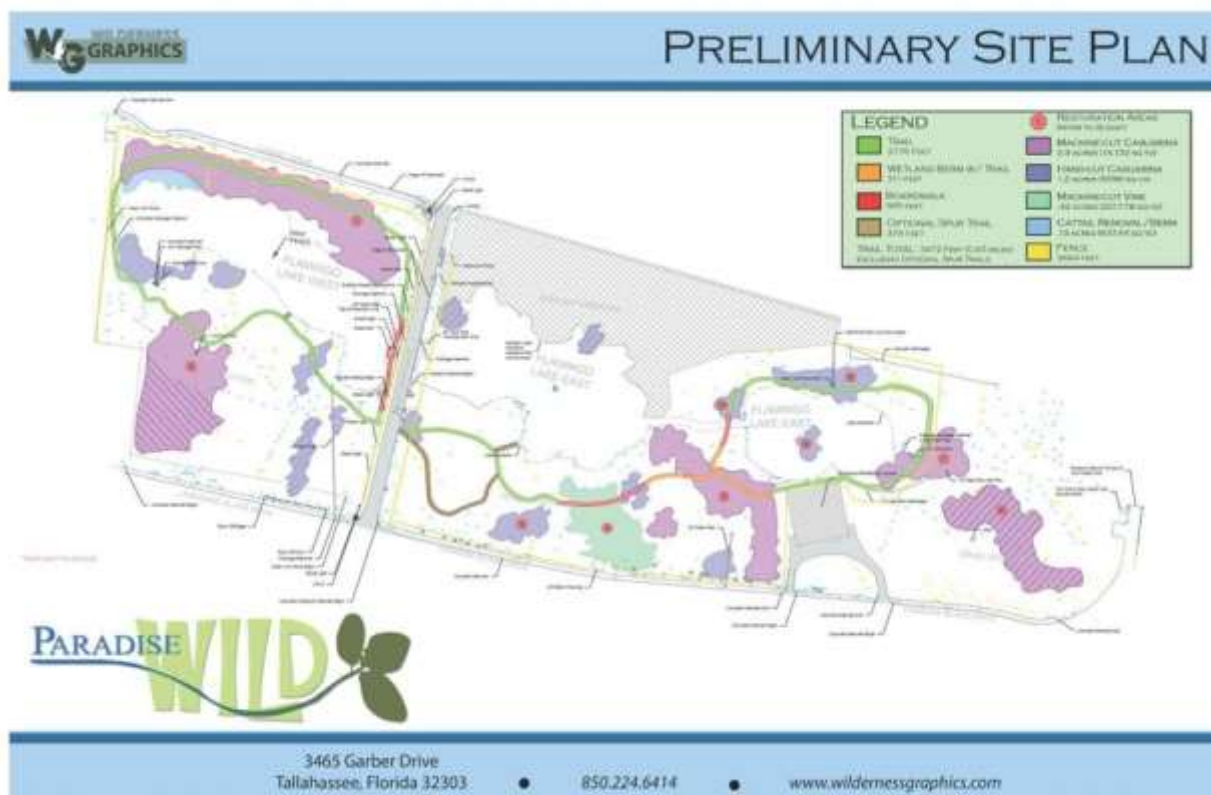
Conceptual nature trial plan and site plan for nature reserve
